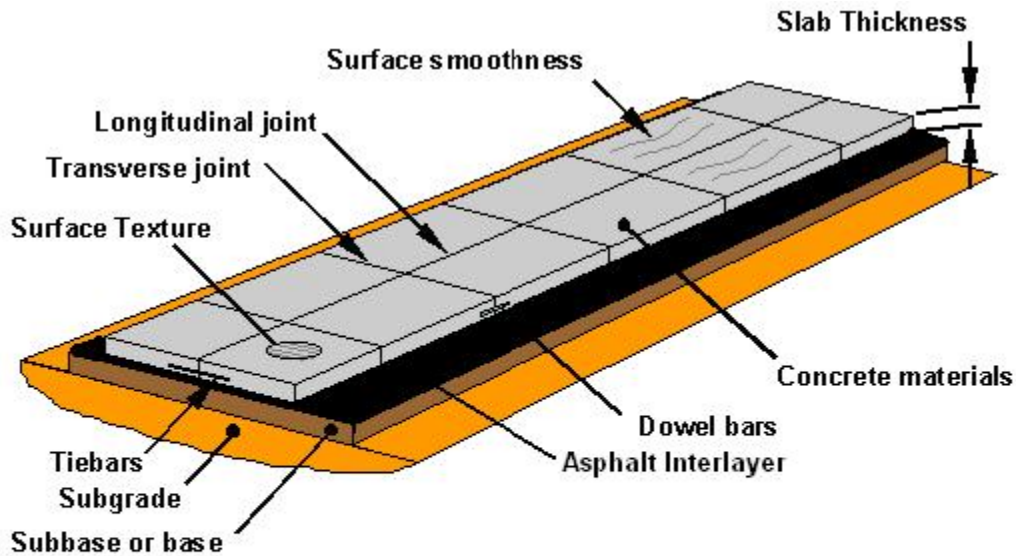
TYPICAL PCC PAVEMENT<sup>3</sup>
